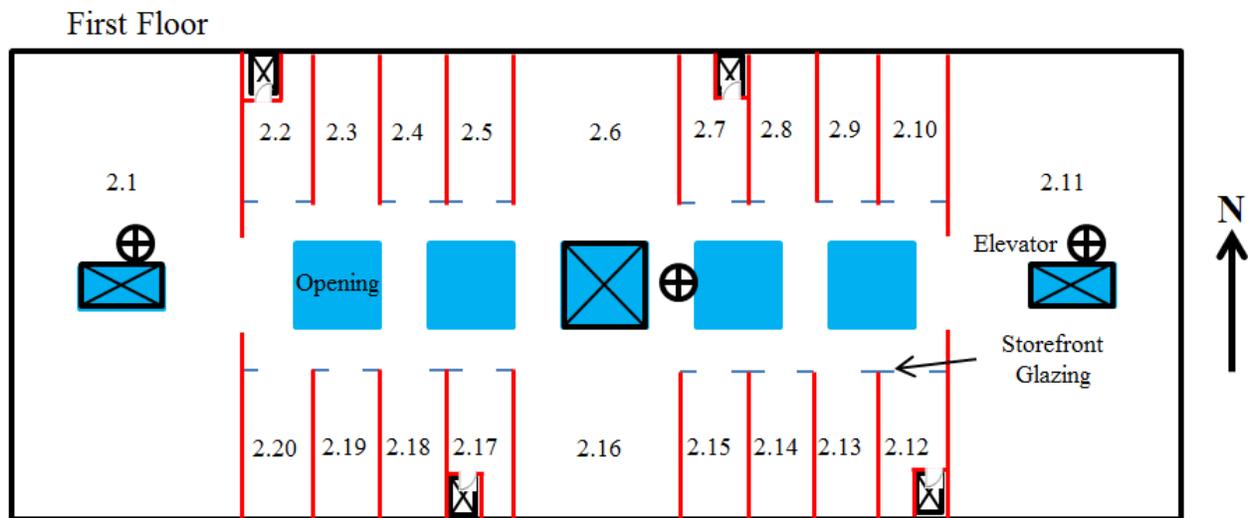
Earthquake damaged WPI Mall first floor layout
